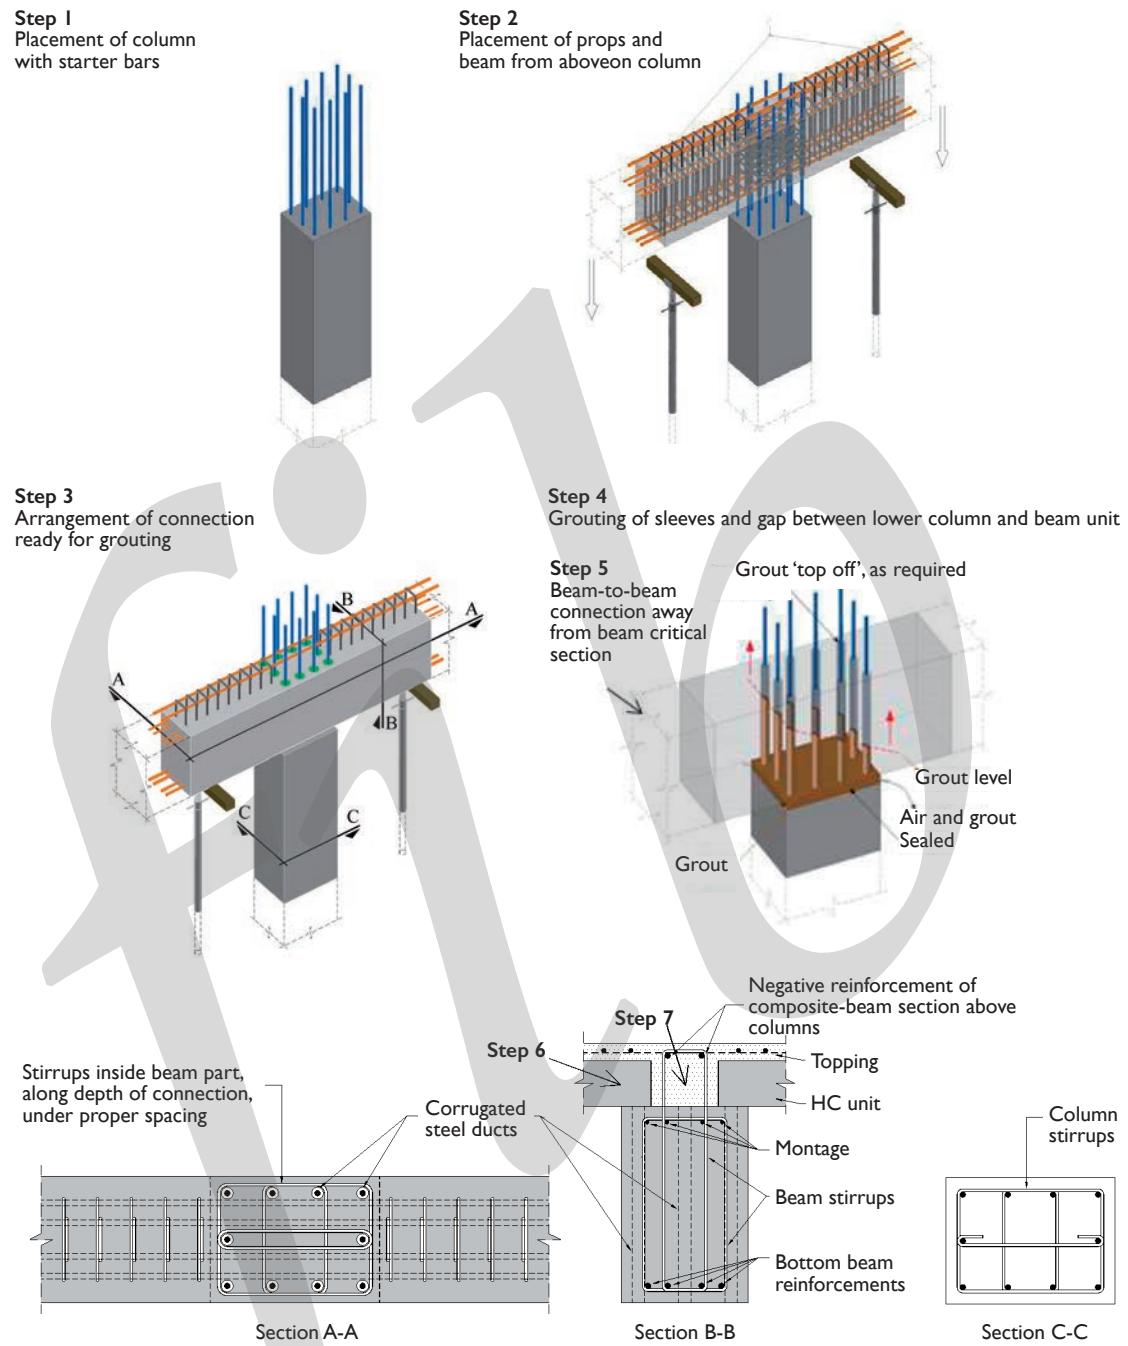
Beam-to-column connection in which precast beam units pass through column
